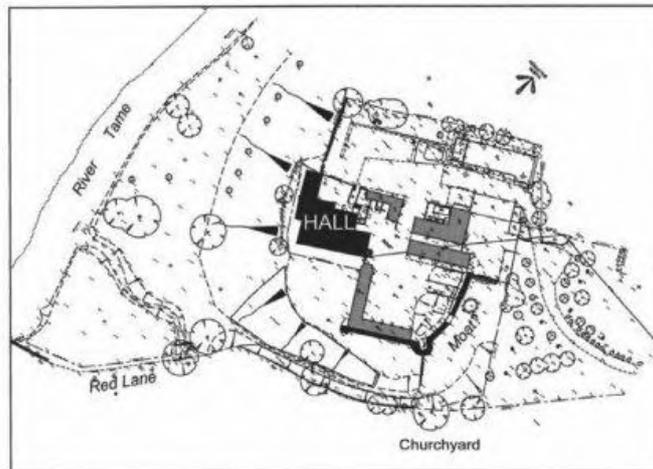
Modern site plan of Kingsbury Hall (approximate scale 1:1500)
